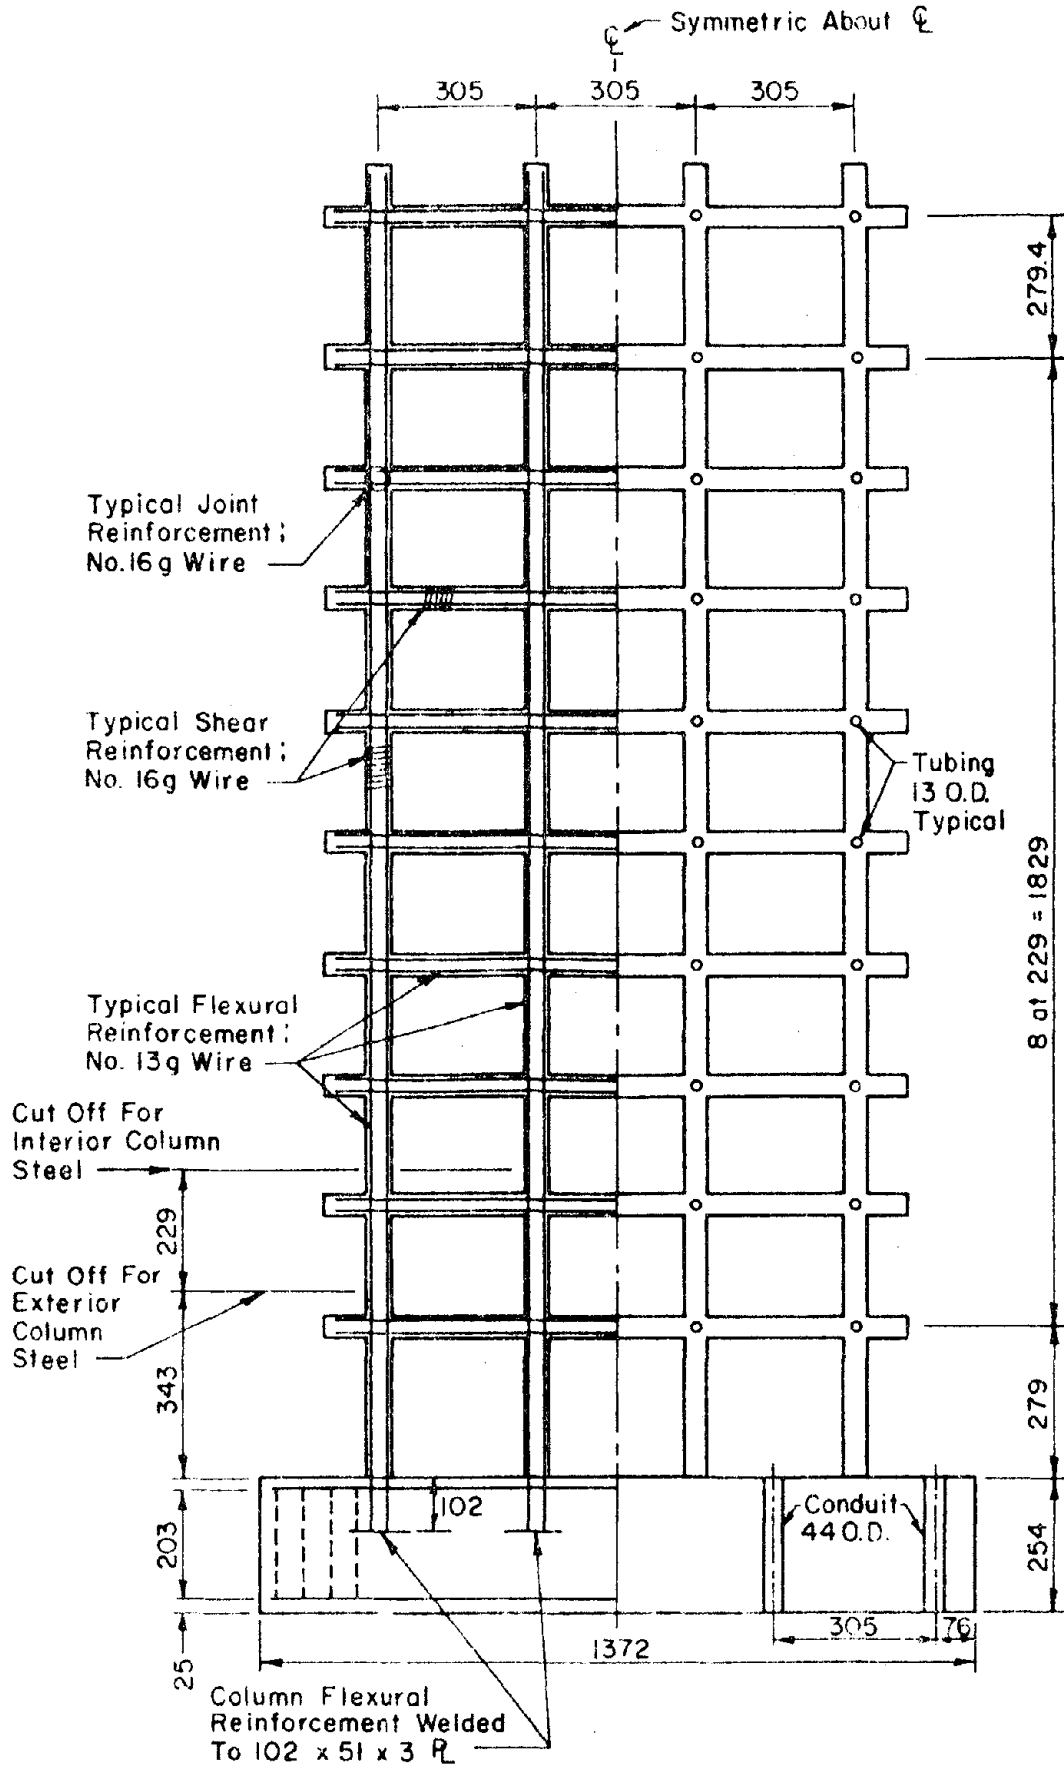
Reinforcement Detail and Dimensions of the Test Structure (Healey and Sozen [3])
